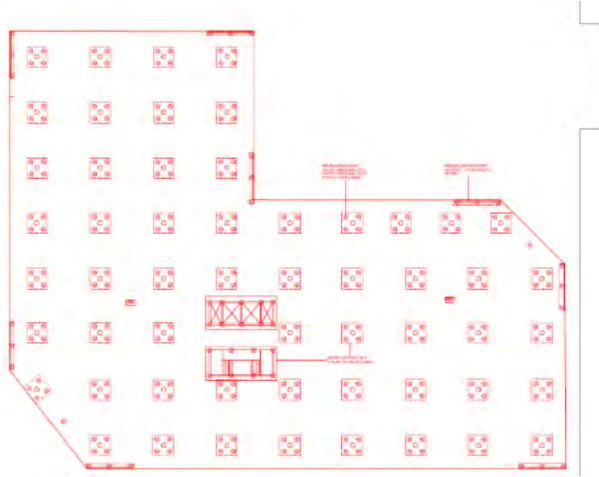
Example footing layout for a commercial building in the Base Scenario precinct.
